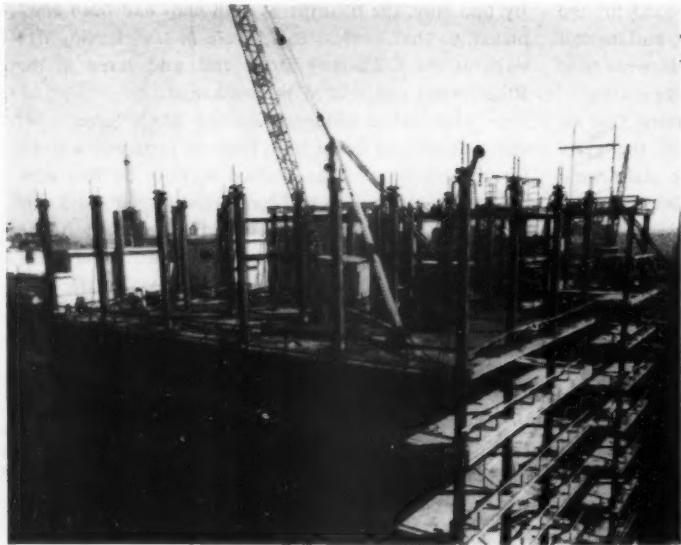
Jacks in position on the tops of the columns for the final lift of the Bligh Street section.
